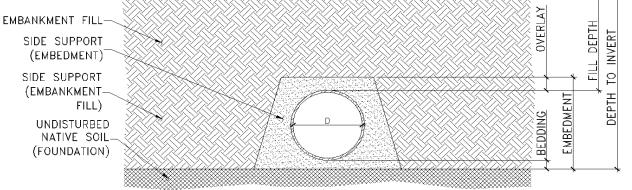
Embankment Installation for Buried Culvert or Storm Drain
